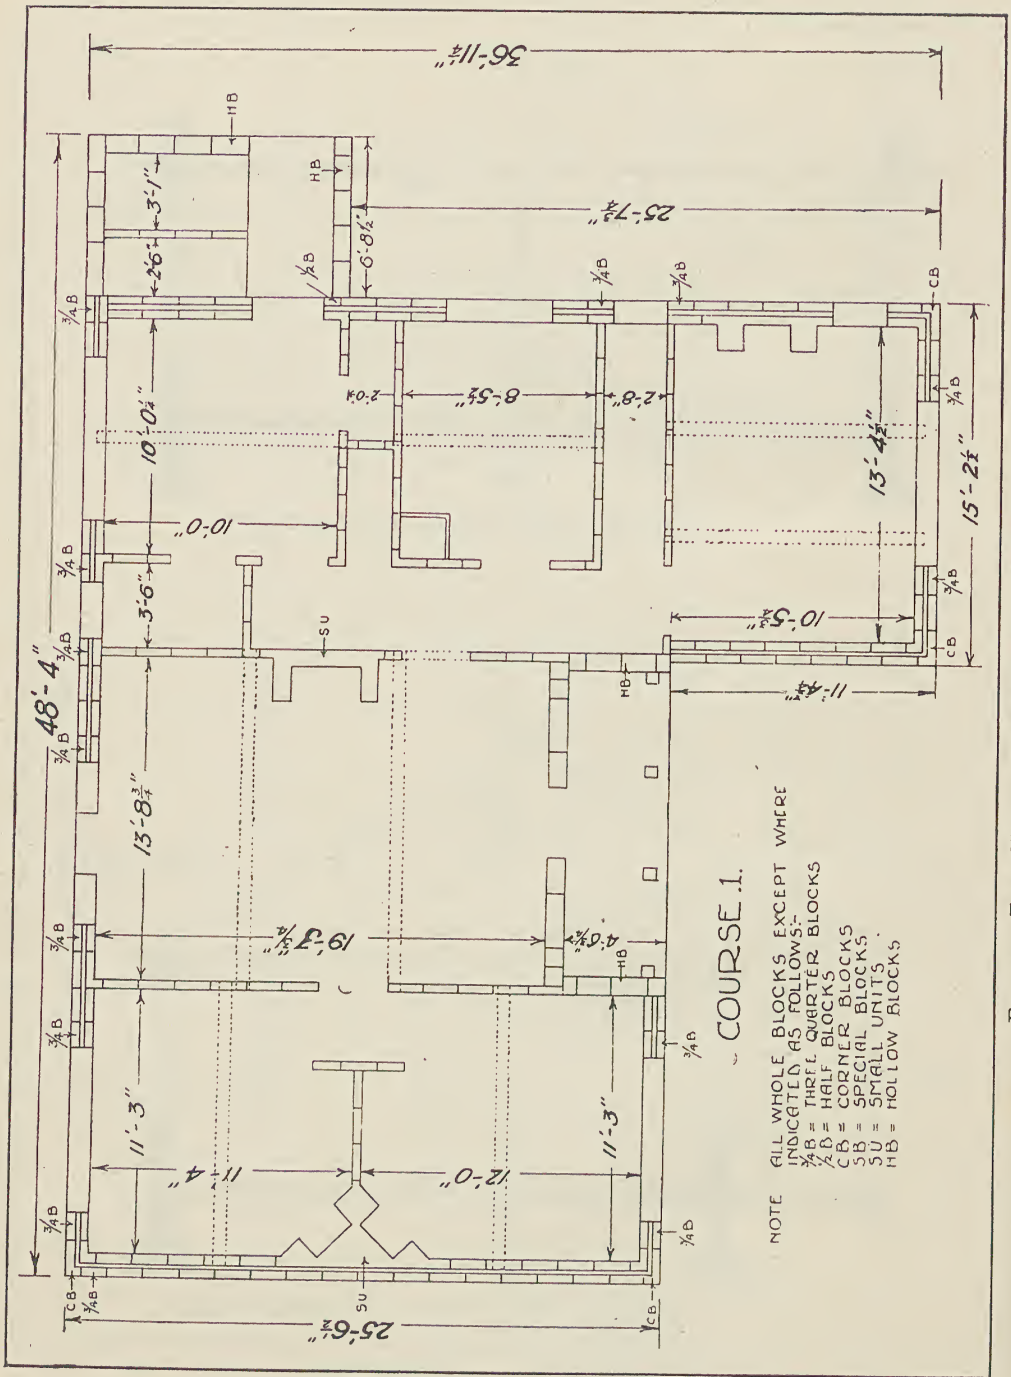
TYPE No. 4: PLAN SHOWING BONDING OF BLOCKS.
